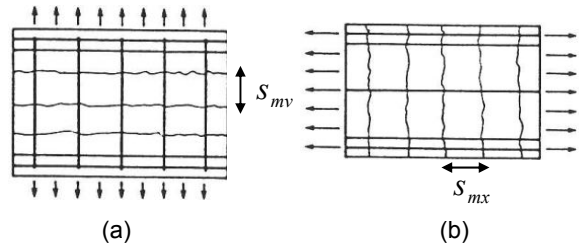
(a) Horizontal cracks due to transverse tension (b) Vertical cracks due to axial tension
